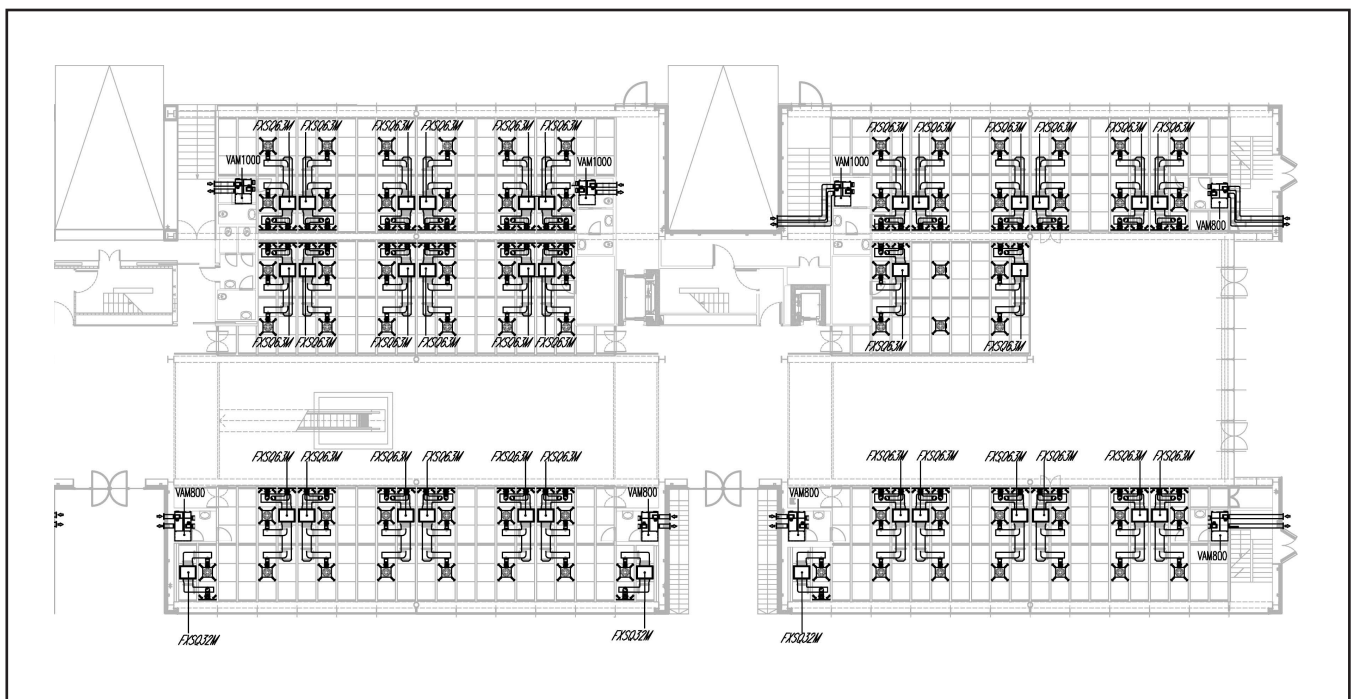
Tendenza Bldg. Typical Floor Plan (2)
